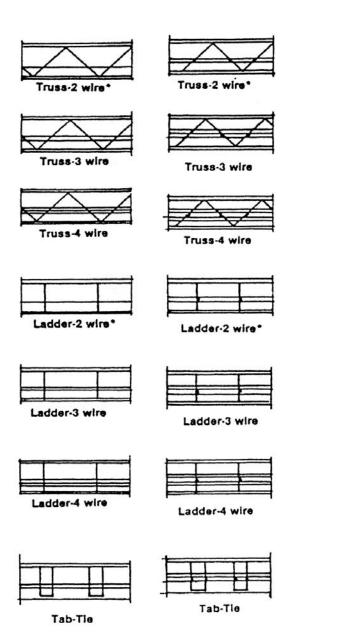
Reinforcement for composite and cavity walls. (From Kolkoski, 1988.)
